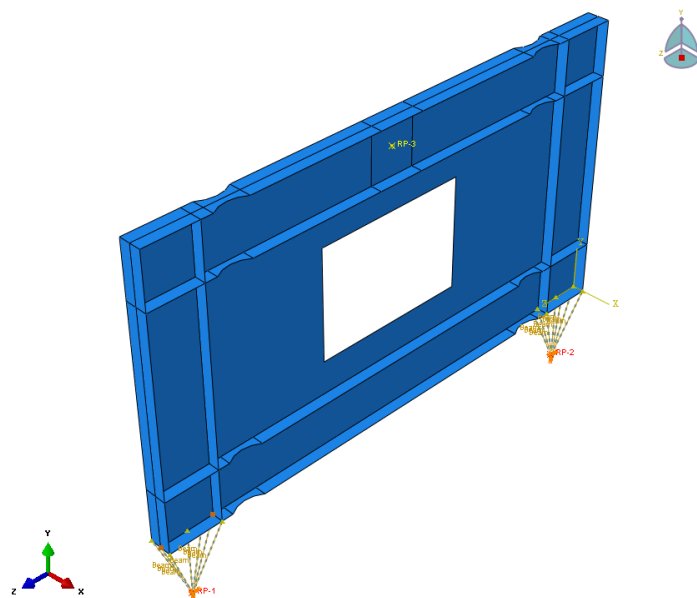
A lower support to a depth of 60 cm in the steel shear wall with opening
